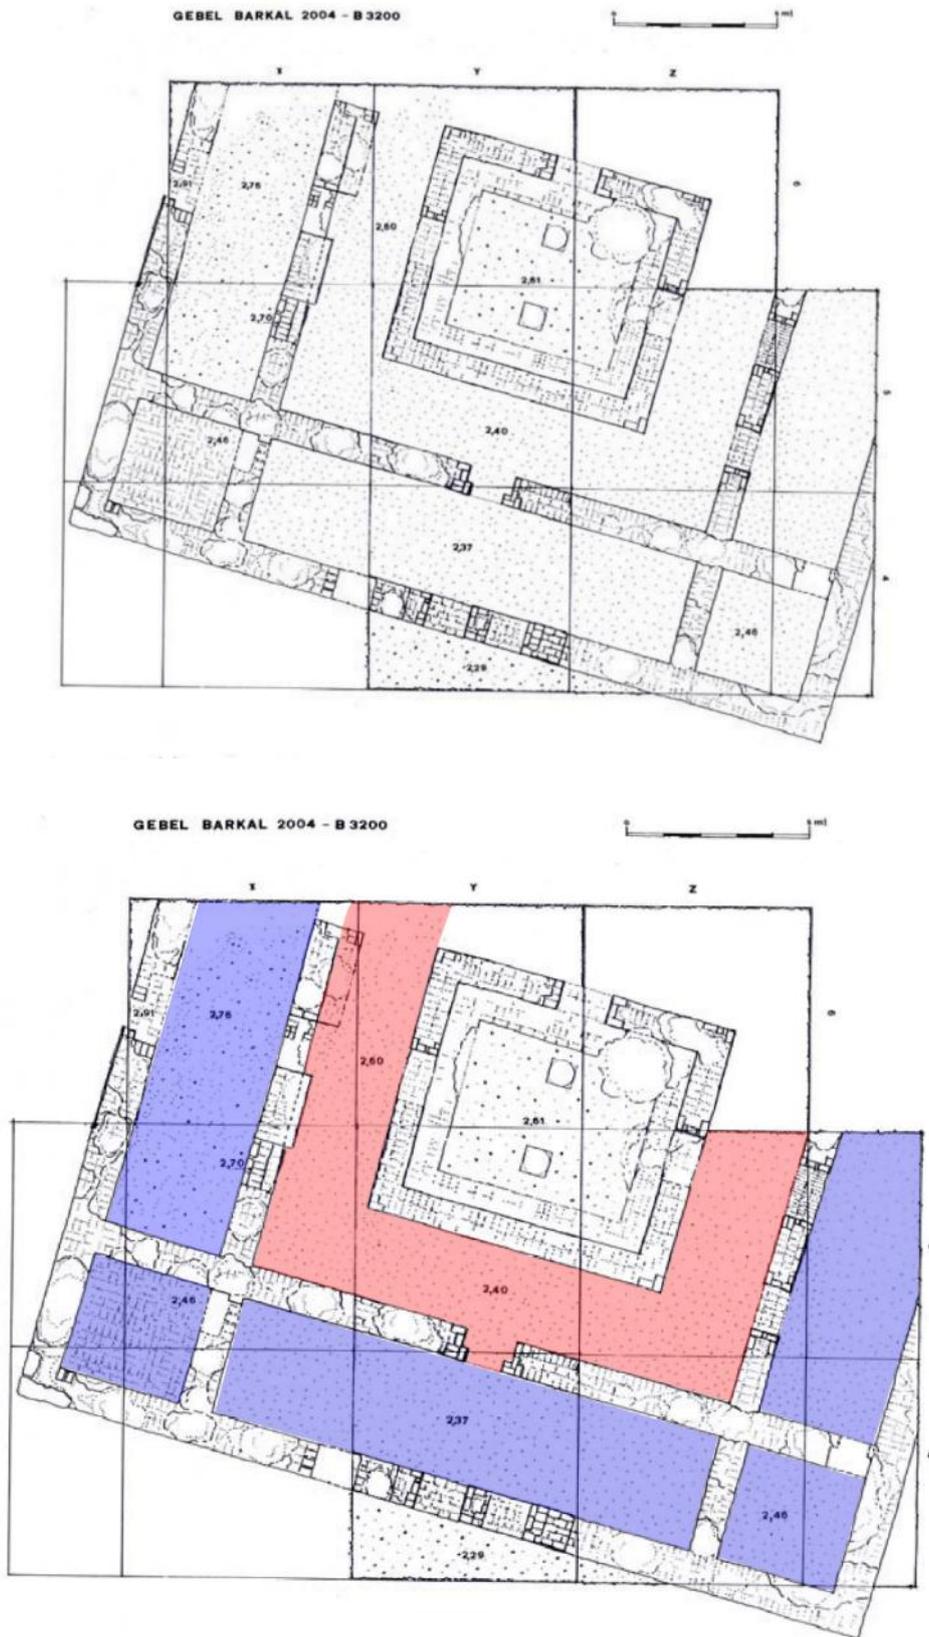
Plan of building B3200 (from SIST 2011): on top: original; on bottom: modified by the author. Highlighted in red: the first – inner – corridor; highlighted in blue: the second – outer – corridor.
